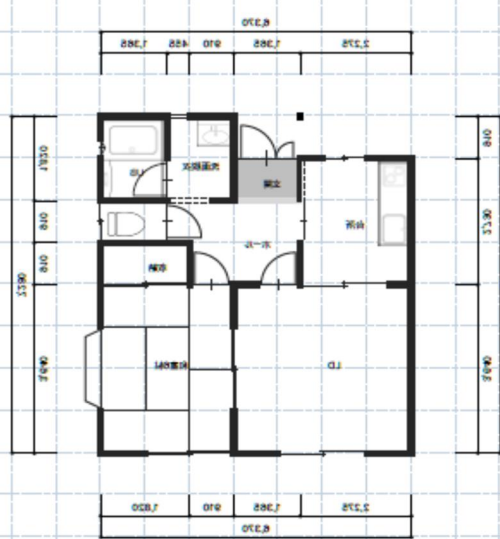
is a detailed architectural floor plan of a house. The plan includes a Living Room (LD), Kitchen (K), Dining Room (DK), and a large Bedroom (BR). The bathroom (B) is located near the entrance, and the toilet (T) is adjacent to it. The plan also shows a balcony (balcony) and a small utility area. Dimensions are provided for various sections: overall width 6,370, overall depth 12,200, and individual room dimensions like 2,275, 1,365, 910, 455, 1,365, 3,640, 2,790, 910, 910, 910, 1,820, 3,640, 2,275, 1,365, 910, 1,820, and 6,370.
